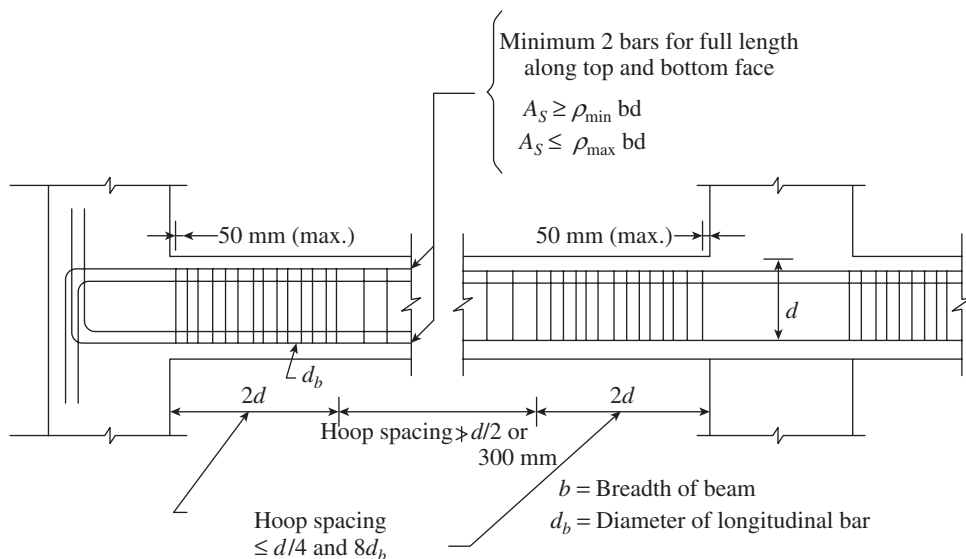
Stirrup arrangement for beams located in earthquake zones
